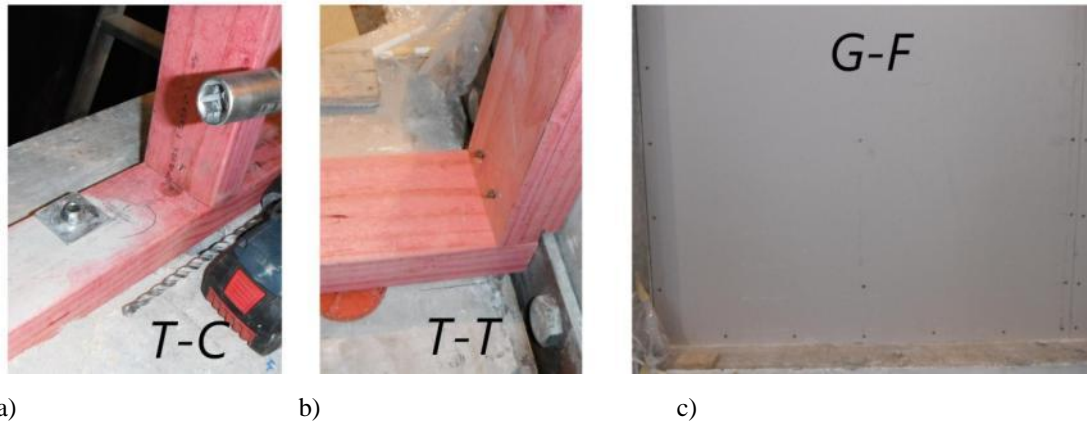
As built timber framed drywall FIF2-TBFD: a) Used timber elements to construct the timber framing, b) Used anchor types
